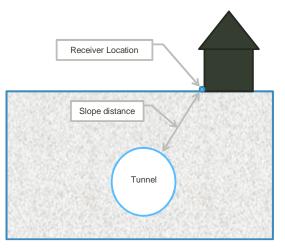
Slope Distance between Tunnel and Receiver Additional Construction Works Equipment
